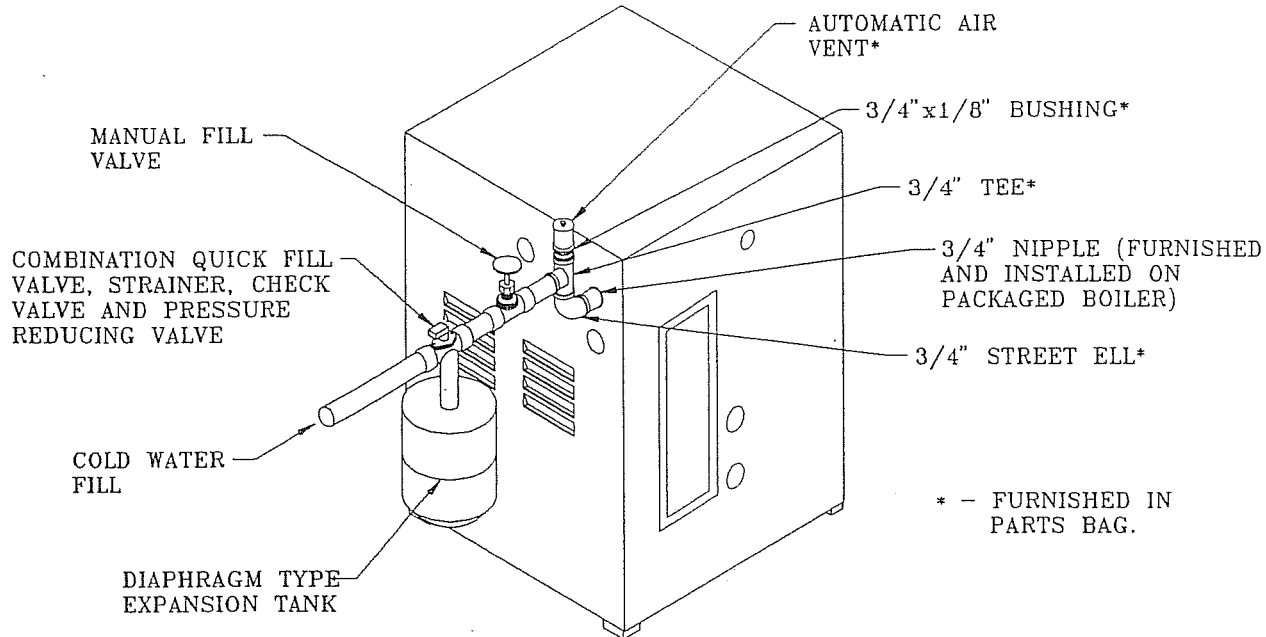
DIAPHRAGM TYPE EXPANSION TANK PIPING
